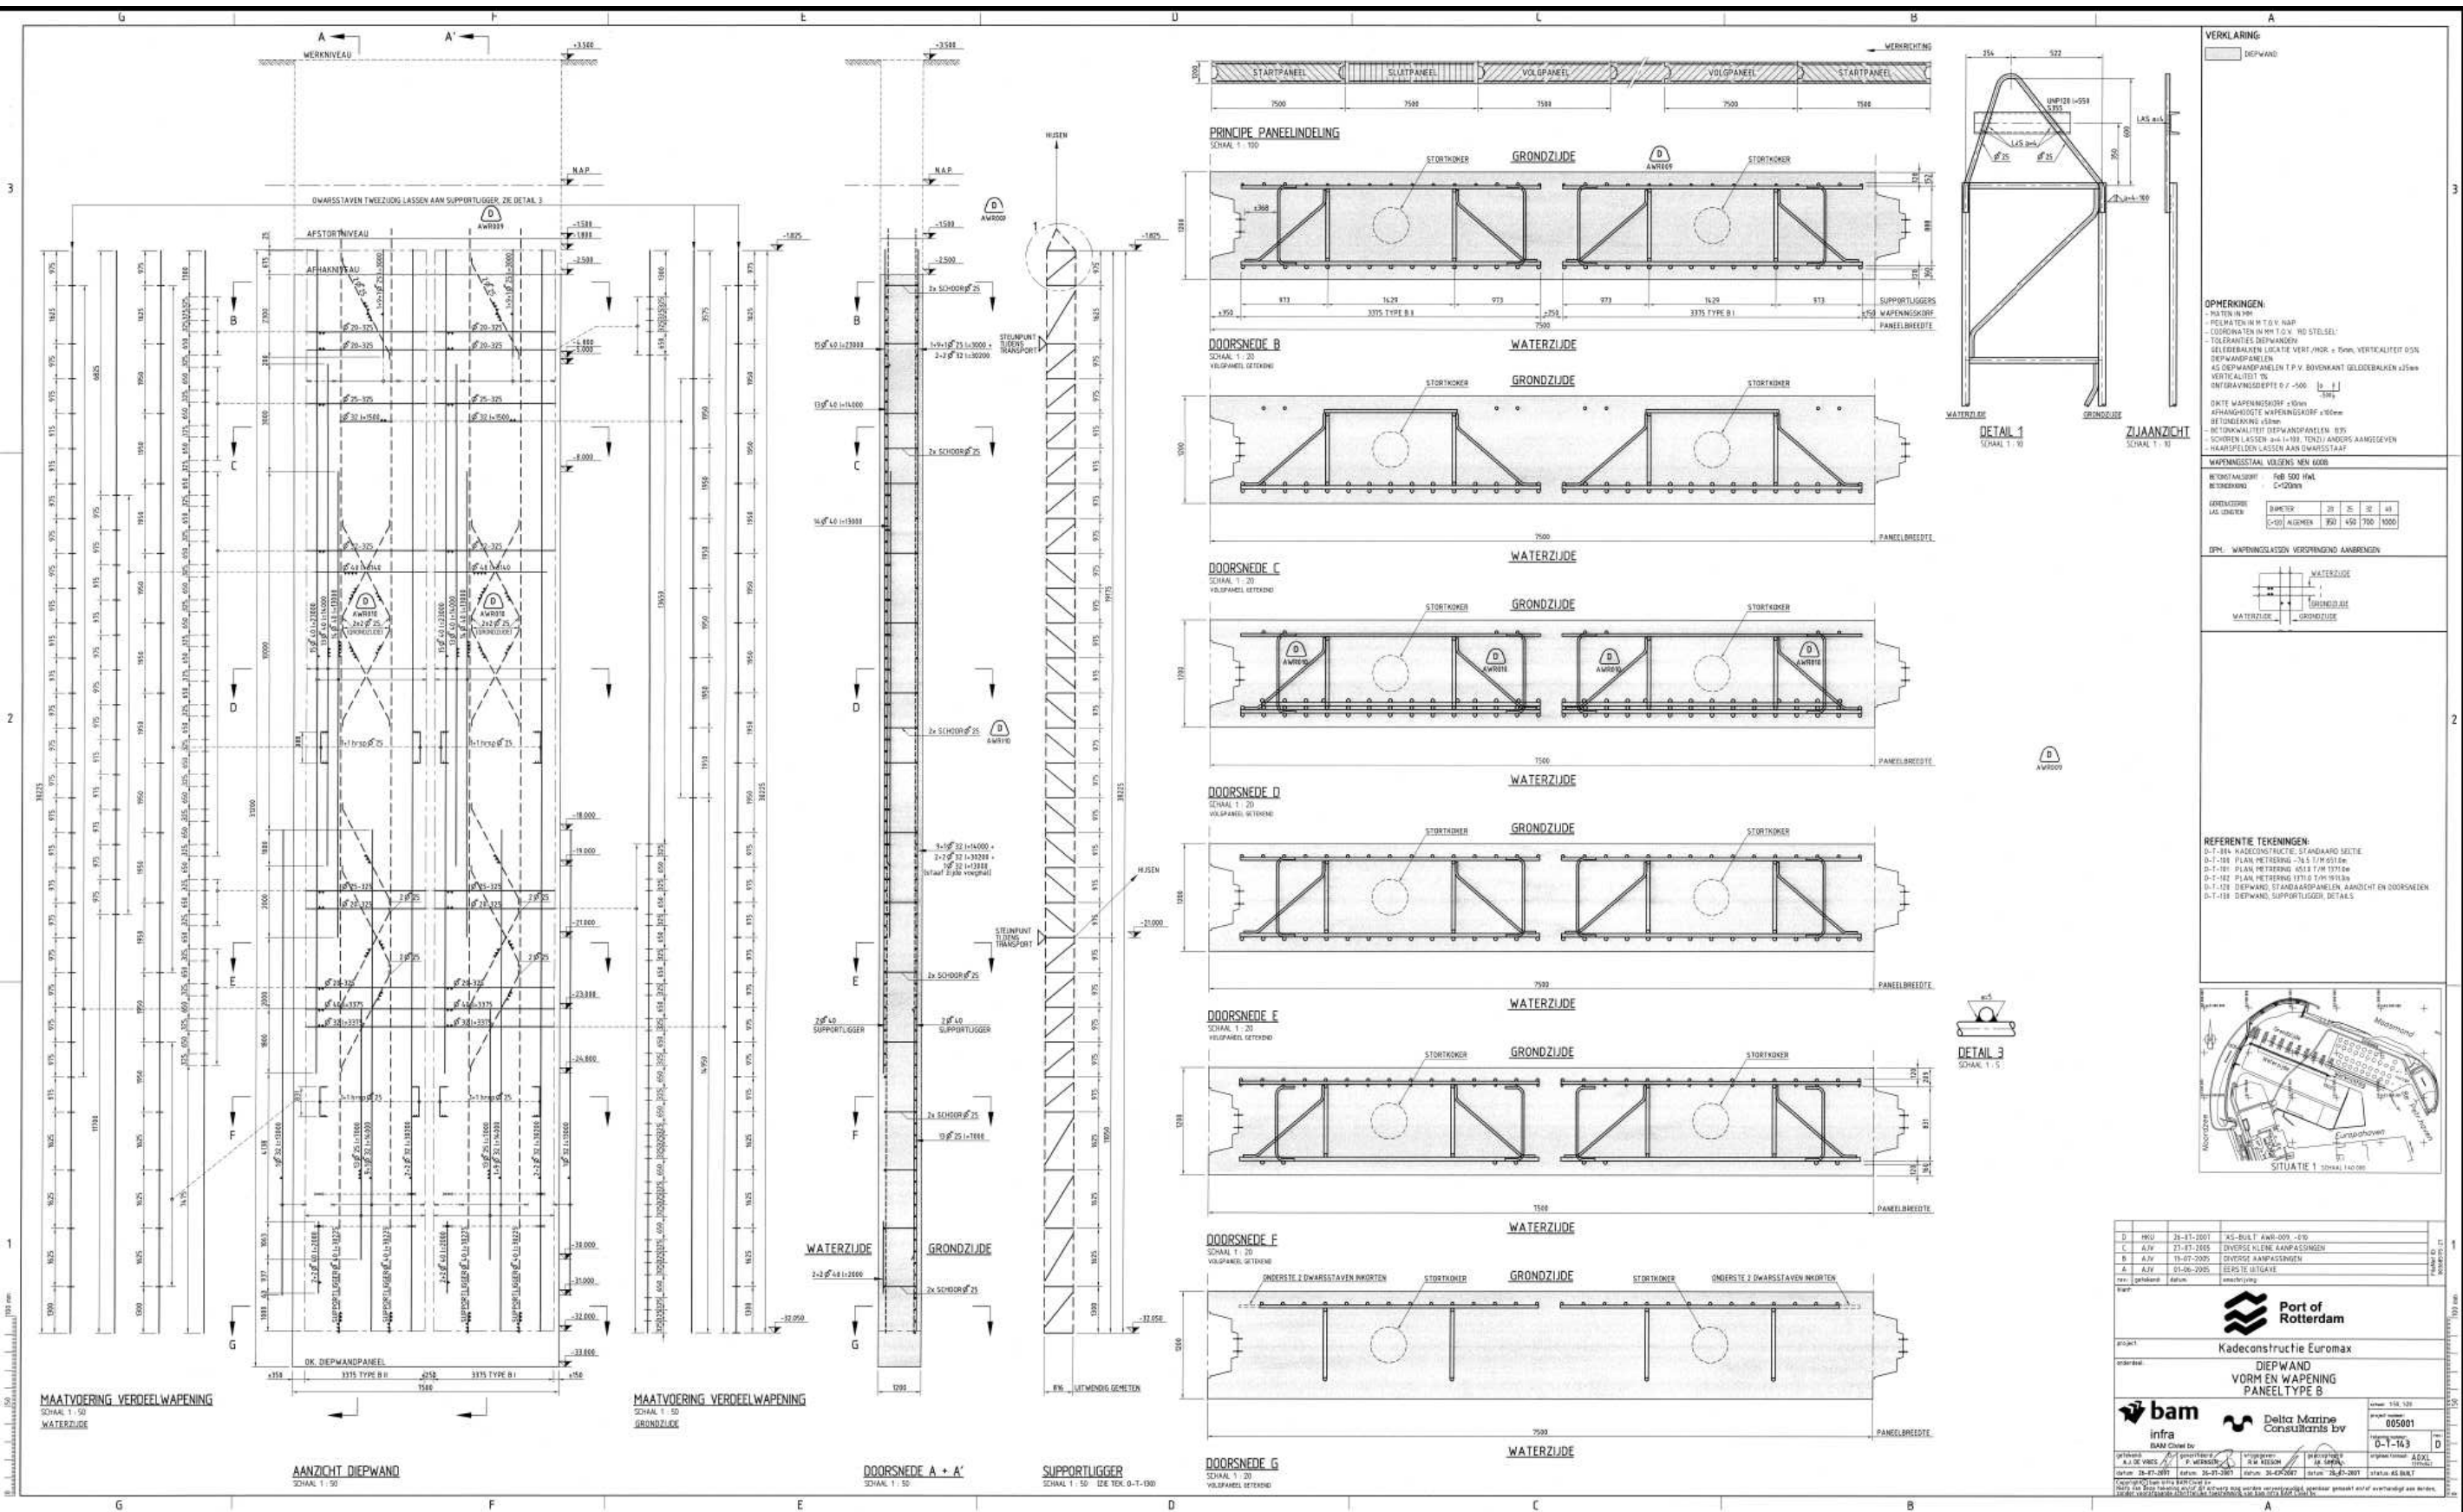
Upper cross-section of diaphragm wall and the location of the reinforcement bars
